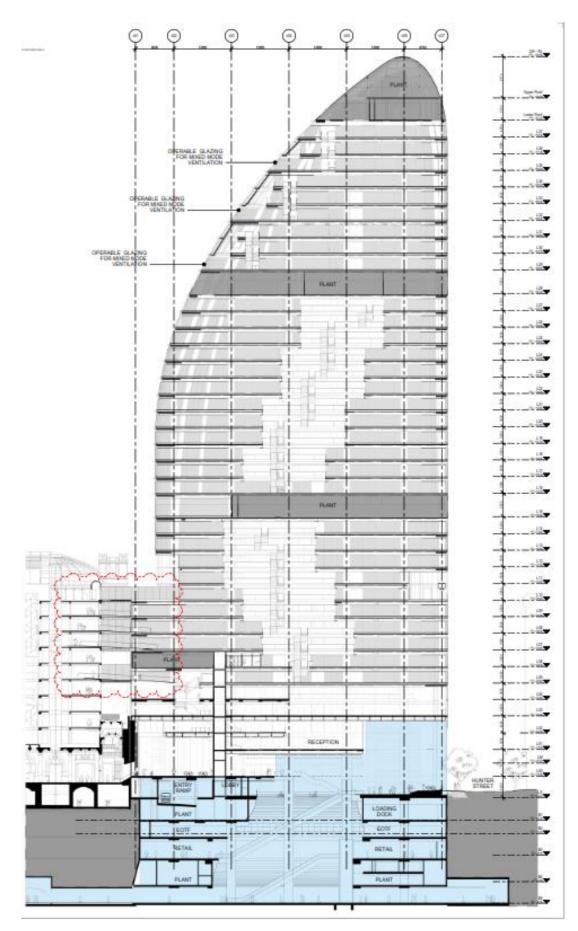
Proposed Level 7, 8 and 9 Bridge Links – North South Section General Arrangement
